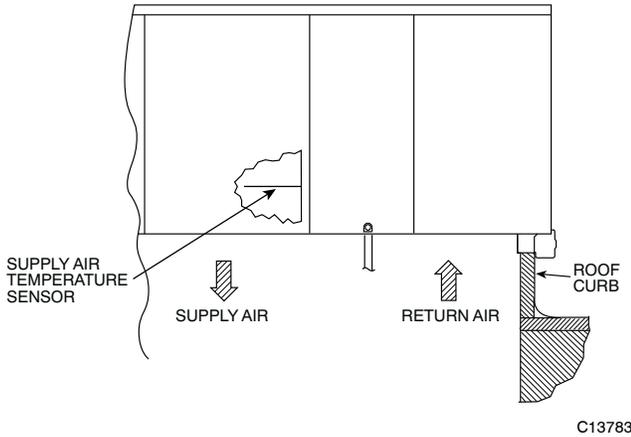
Mounting Location for Supply Air Temperature (SAT) Sensor on 48TC Units
